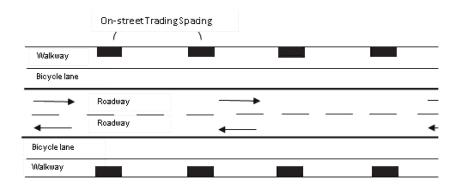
Image showing street plan where street trading is accommodated (Complete Streets Design Guideline, 2019)
